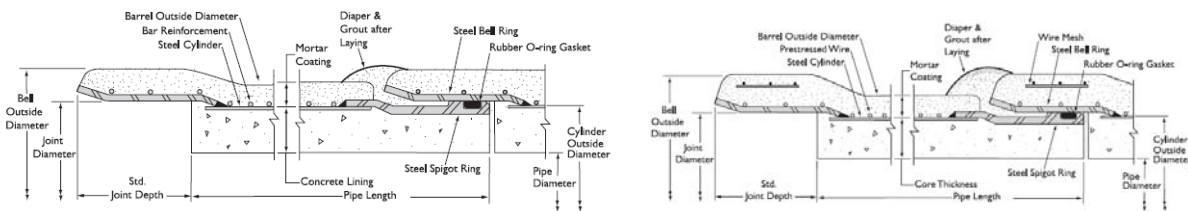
Section concrete lined cylinder pipe Figure 11 Section concrete bar wrapped cylinder pipe
